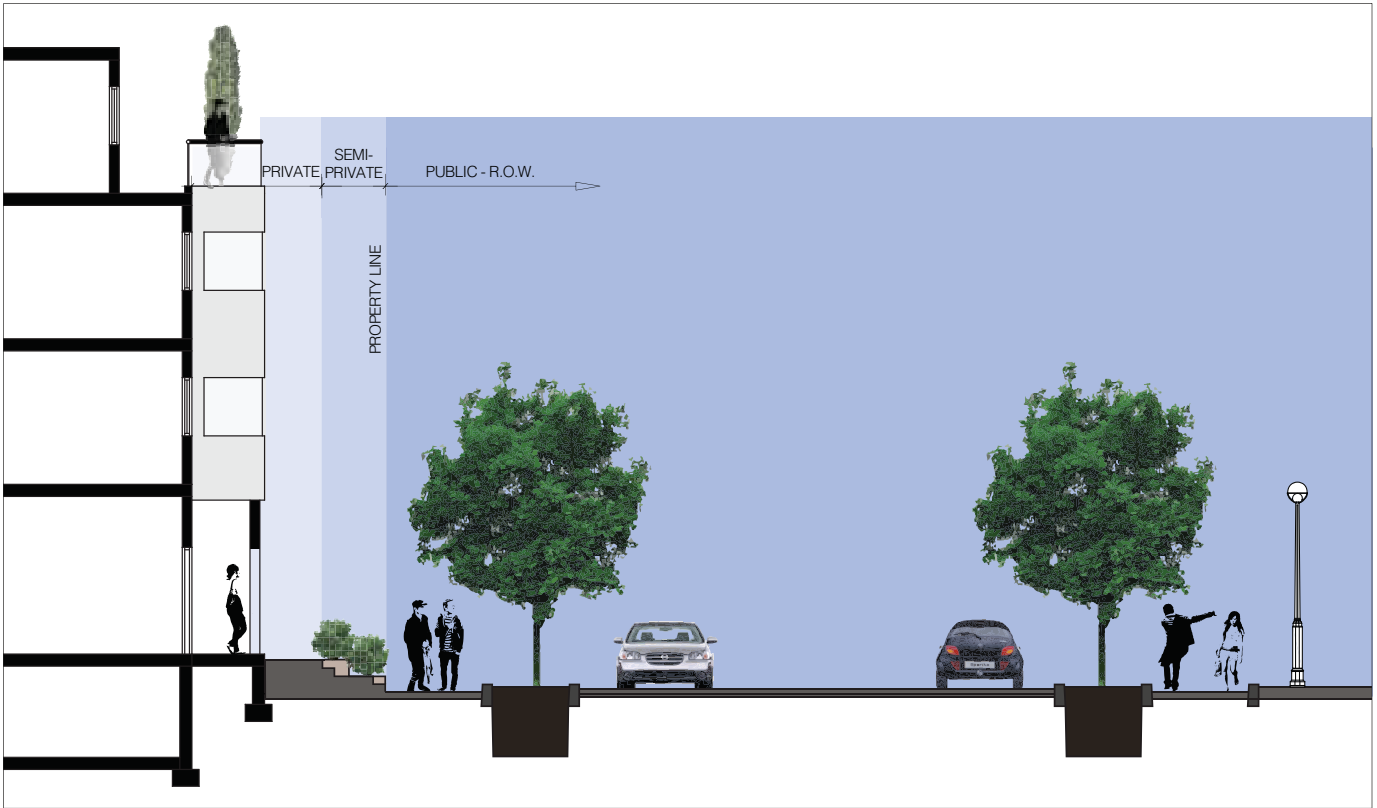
Section illustrating at-grade residential uses where a semi-private zone, shown here slightly elevated, promotes privacy between grade level rooms and the public street and/or open space.
